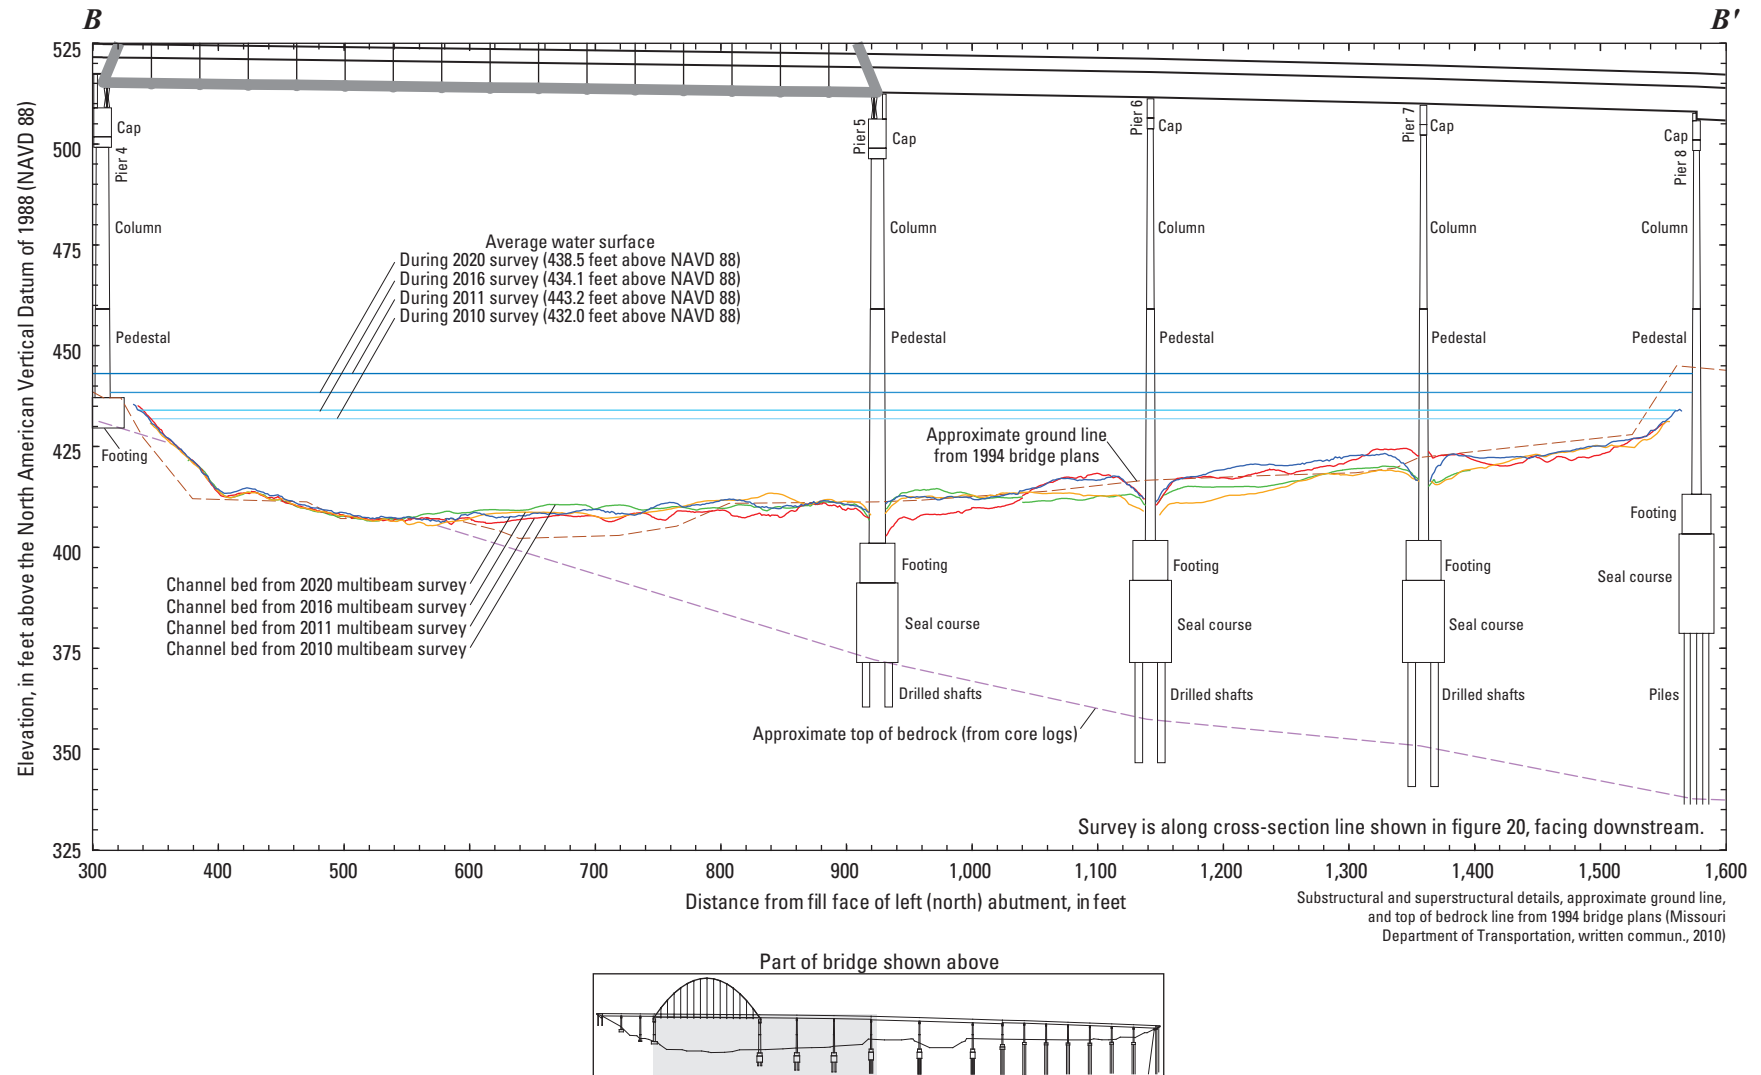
Key features, substructural and superstructural details, and surveyed channel bed of downstream structure A5585 on State Highway 364 crossing the Missouri River near St. Louis, Missouri.
